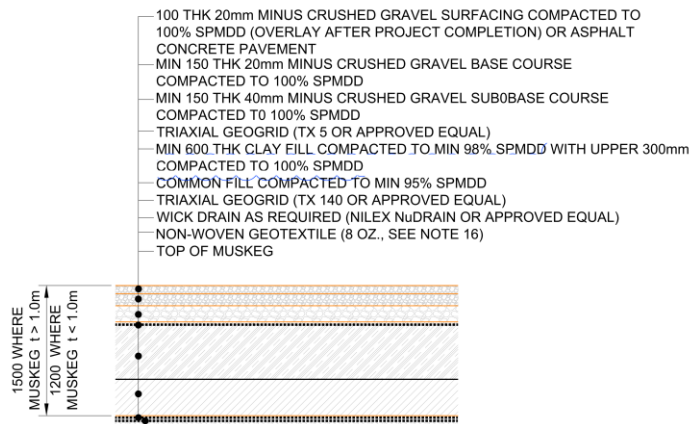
Typical primary road structure design for roads passing a wetland / muskeg area
